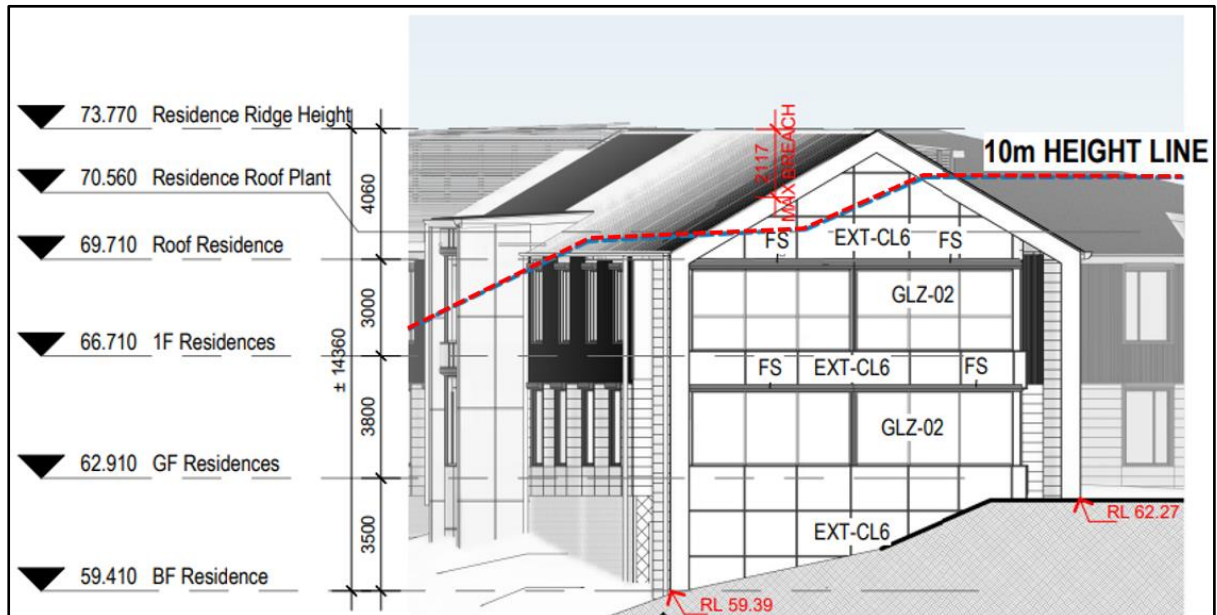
| Residential Pavilion 4 eastern elevation (Source: Applicant's SRtS)
